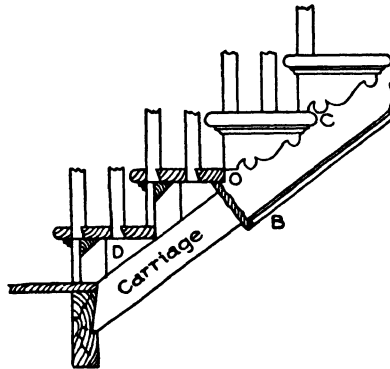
End Portion of Cut and Mitered String with Part Removed to Show Carriage
